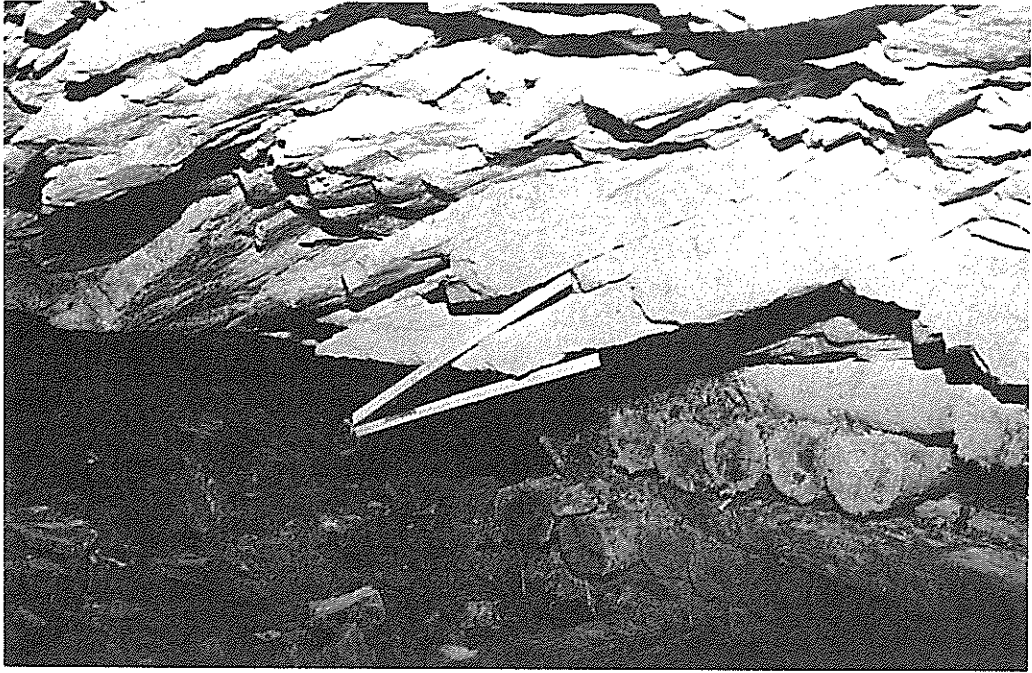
DOWNWARD-CURVING, HANGINGWALL-PARALLEL FRACTURES ON THE NORTH SIDE OF A WIDE ADVANCE HEADING
